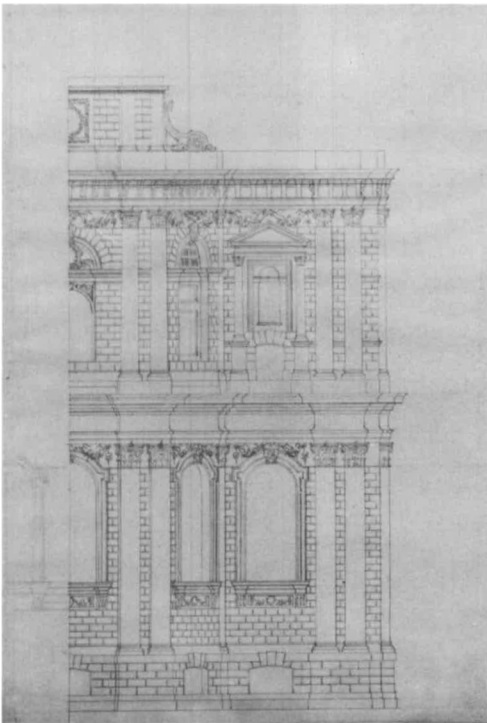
Wren. Half elevation of east end of St Paul's (Guildhall, cat. 64)
